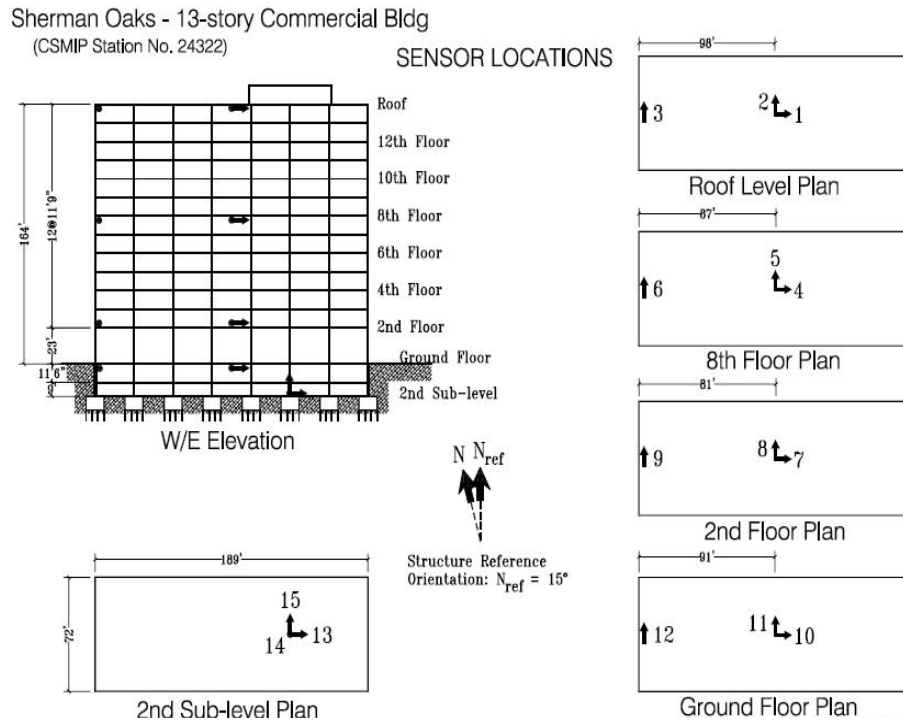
Layout of the sensors installed at Sherman Oaks building (taken from CSMIP web site).
